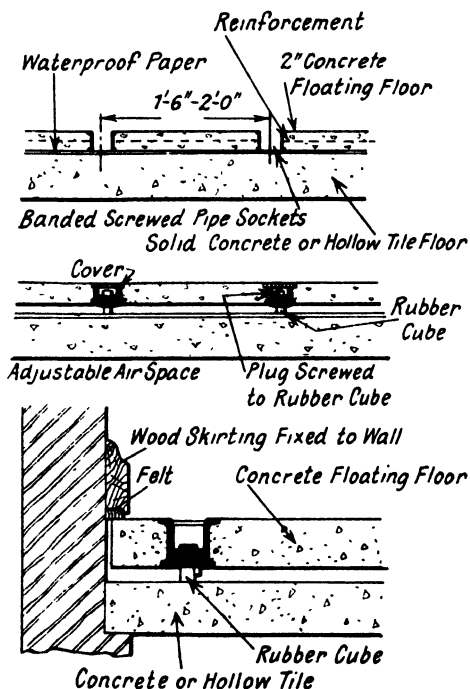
DETAILS OF THE BUILDING RESEARCH STATION'S CONCRETE FLOATING FLOOR
